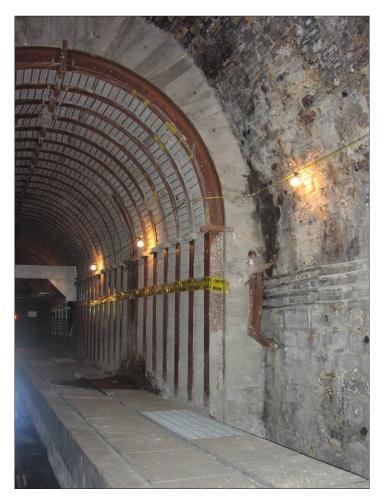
Woodhead Tunnel: Concrete and steel reinforcement to North Bore with cable conduit in foreground
